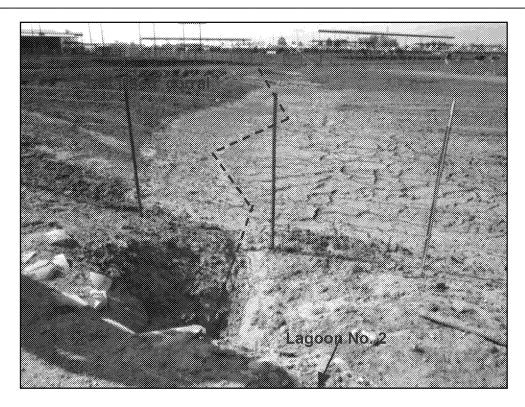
View facing west of standing water on the south side of disposal field No. 2, between lagoon No. 2 and basin No. 3.
